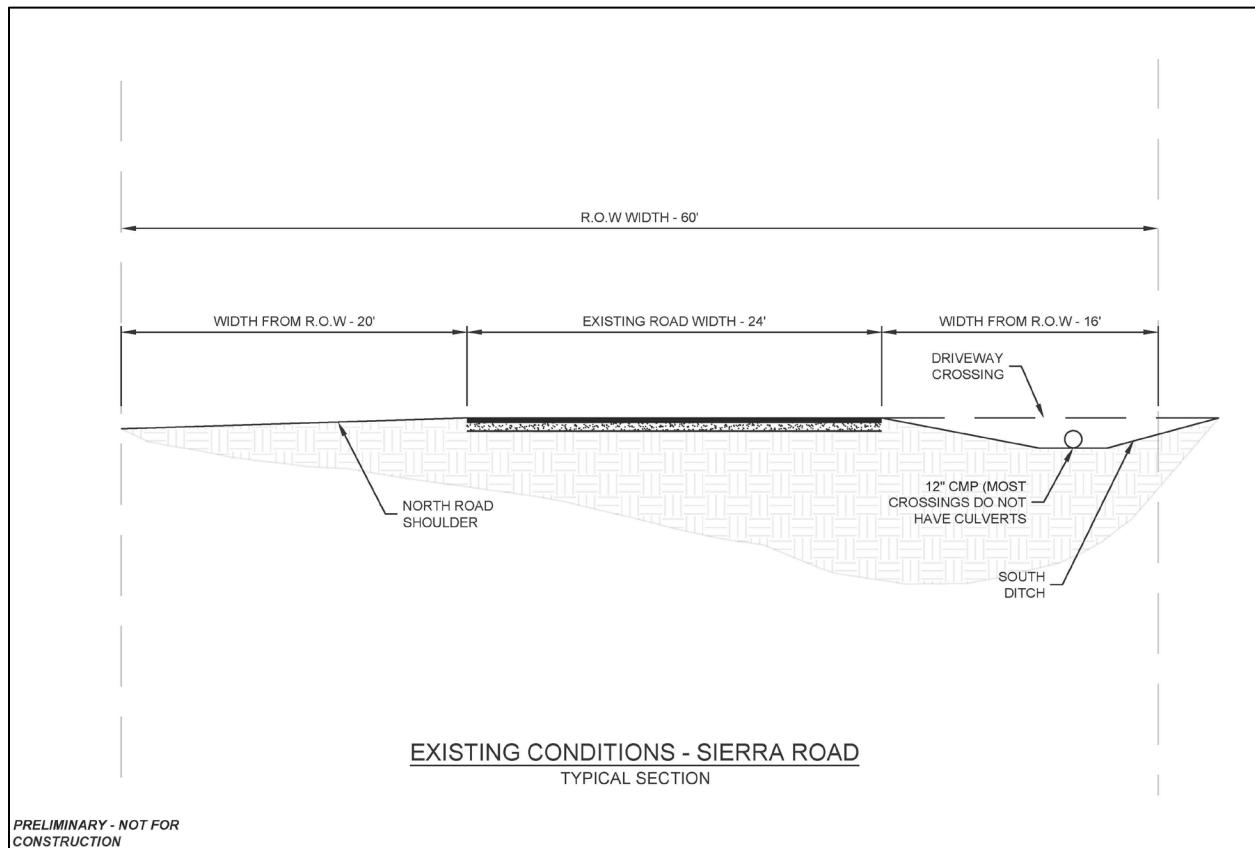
Typical section depicting the existing conditions on Sierra Road.
